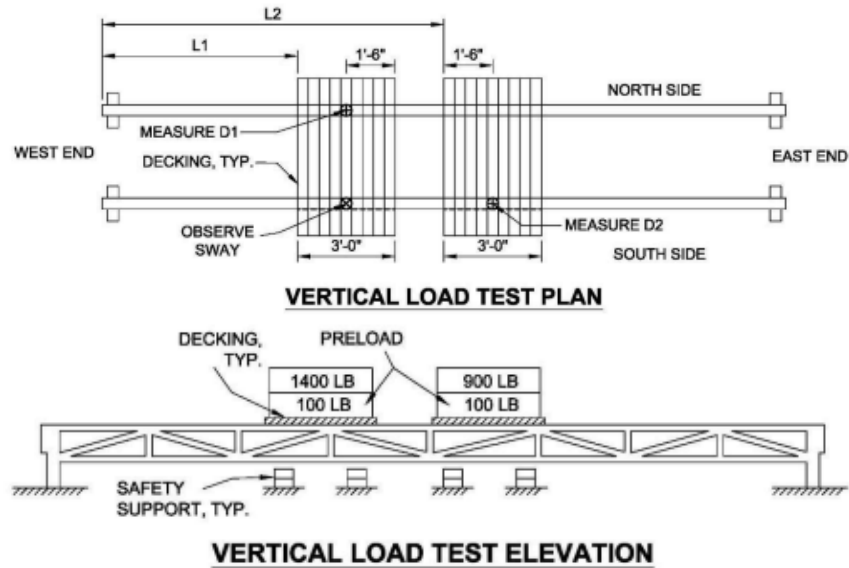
Vertical Load Test Plan and Profile View [5]
